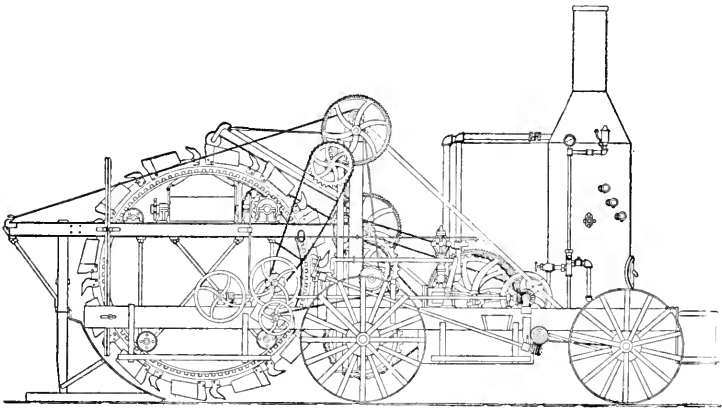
Traction ditching machine. A modern machine for constructing tile ditches. (See Fig. 91.)
